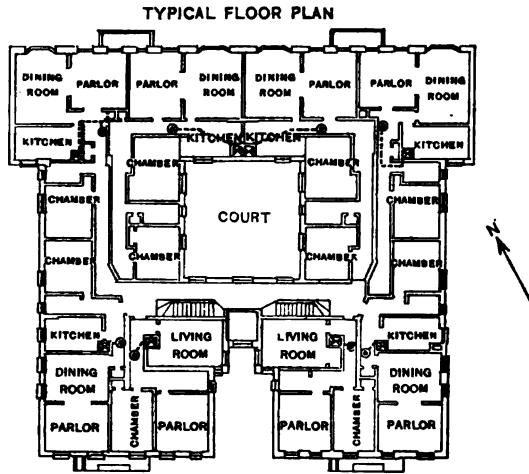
6-STORY NON-ELEVATOR APARTMENT HOUSE.
